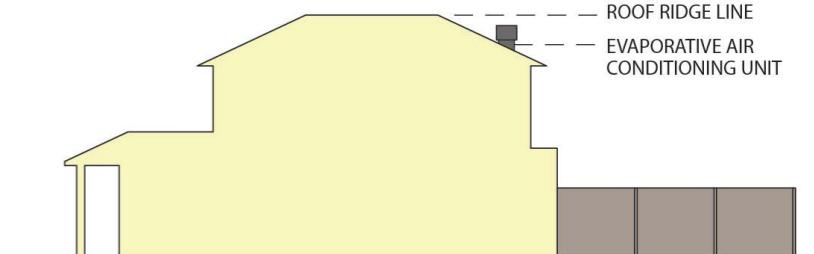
Roof mounted air conditioning plant roof must be positioned to the rear half of the roof, and below the roof ridge.
